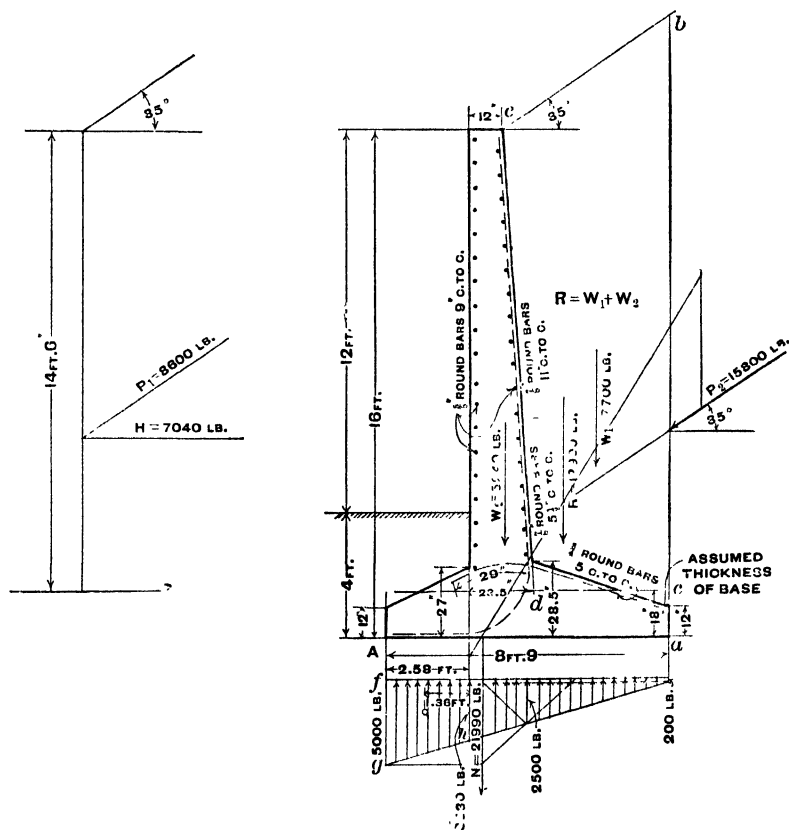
Design of T-shaped Retaining Wall. (See p. 763.)
